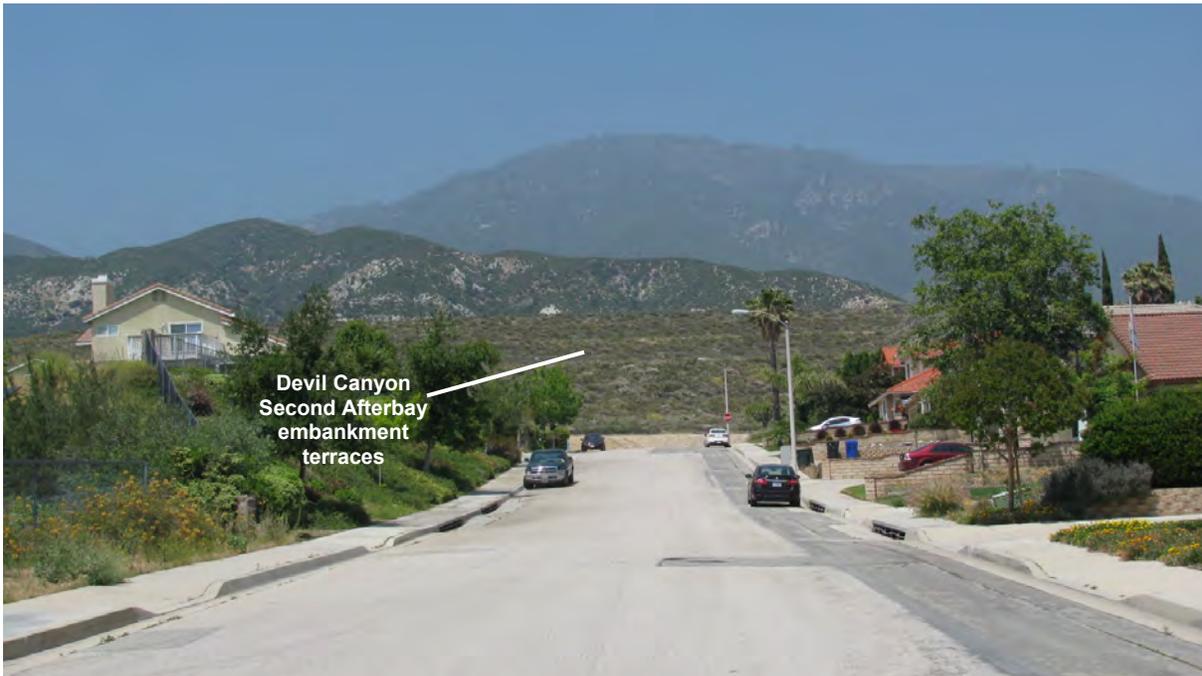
Devil Canyon Second Afterbay Embankment Terraces as Viewed from North Walnut Avenue
